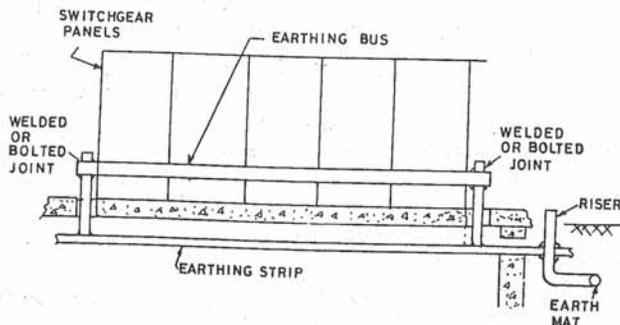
C.4. Equipment Earthing Facility in Metal Clad-Switchgear.
